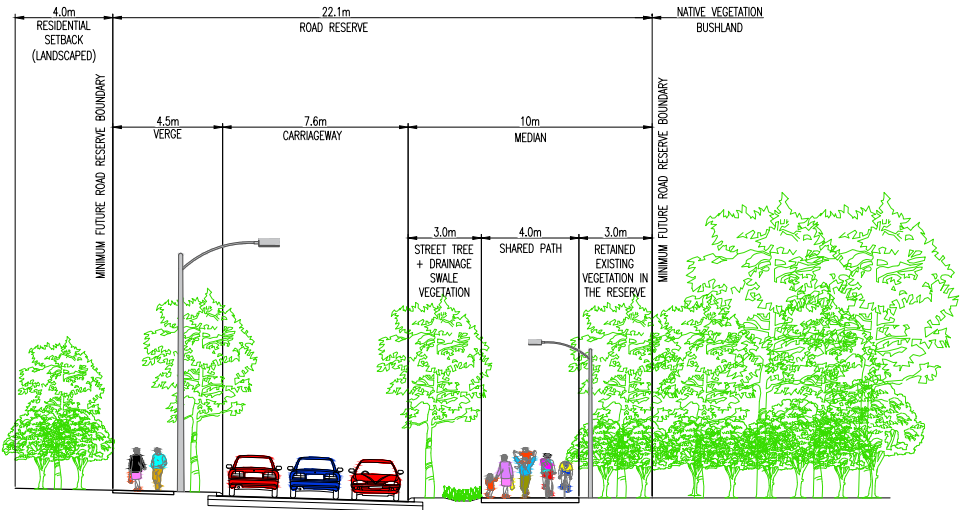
CROSS SECTION OF LANDSCAPE BOULEVARDS
